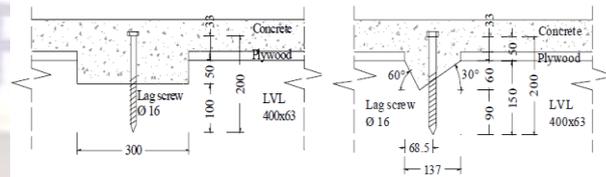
Details of the rectangular (left) and triangular (right) notched connections tested at the University of Canterbury (dimensions are in mm) [14]
